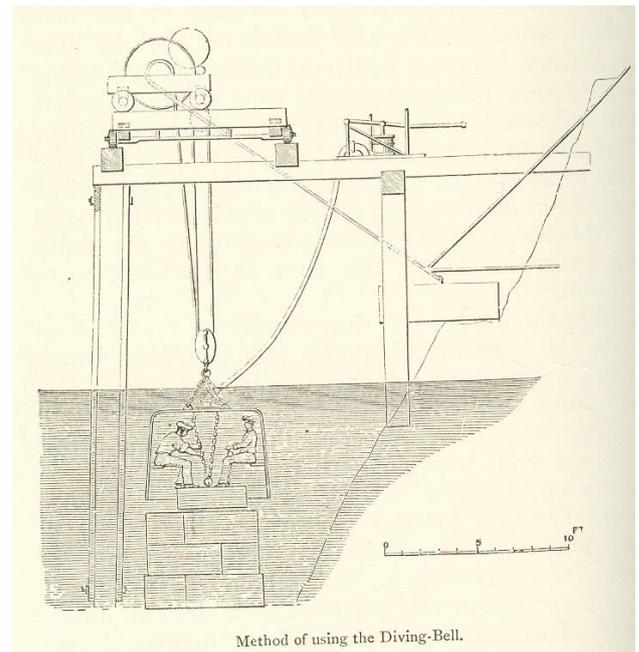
Section of Rennie’s diving-bell building the base of a (vertical section) pier.
